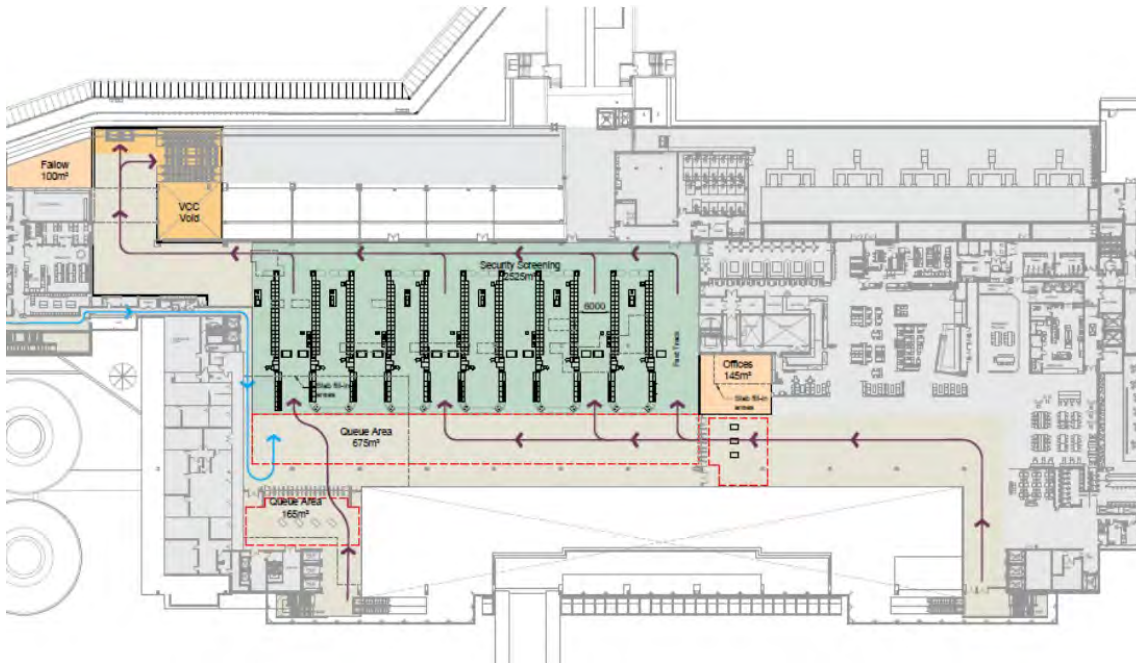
Layout of new proposed CSA at mezzanine level in terminal 1
